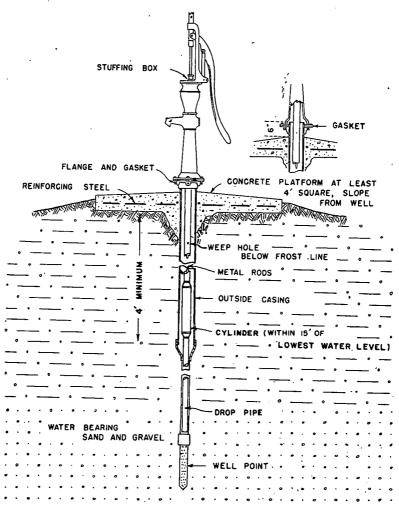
Protective outer casings are needed for driven wells. The cylinder and weep hole may be placed below frostline by excavating at least 4 feet deep and attaching 4 inch outside casing to drive pipe with a threaded reducer.
